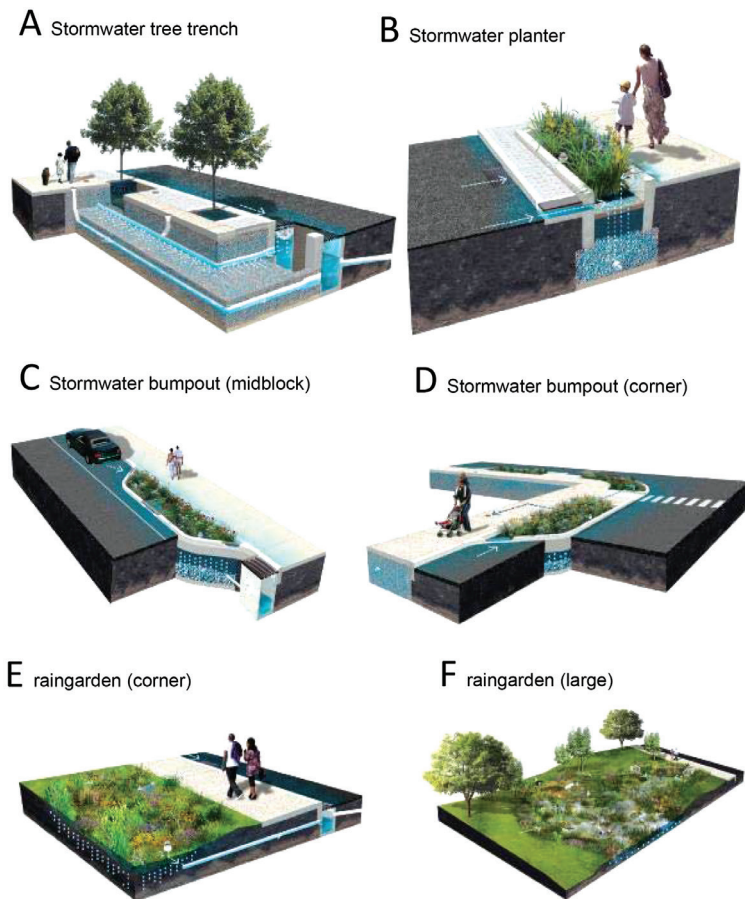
Storm water Management Practices, Philadelphia (source: [17]): A.Stormwater tree trench, B) Stormwater planter, C) Stormwater bumpout (midblock), D) Stormwater bumpout (corner), E) raingarden (corner) F) raingarden (large)
